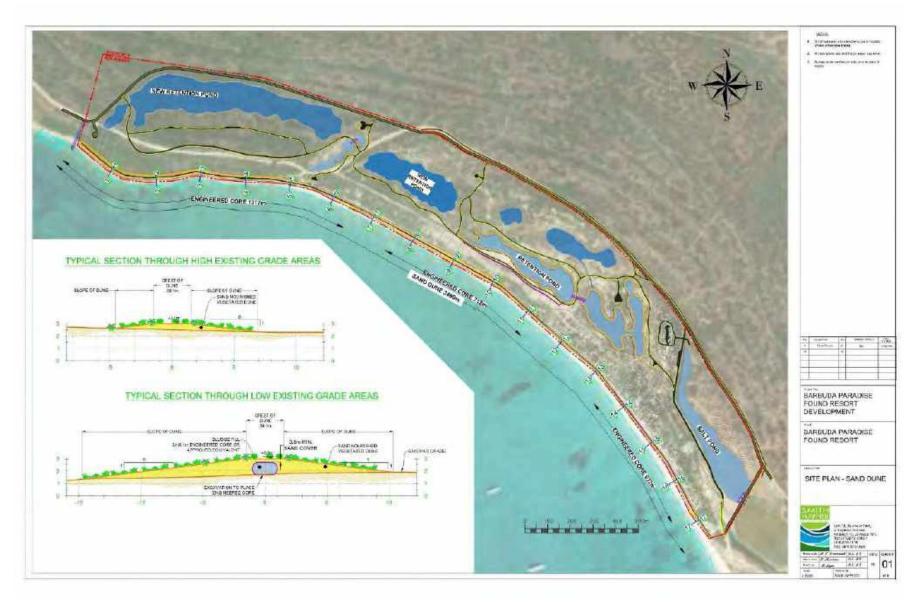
Plan and cross-sections of proposed vegetated sand dune (shown in plan in orange)
